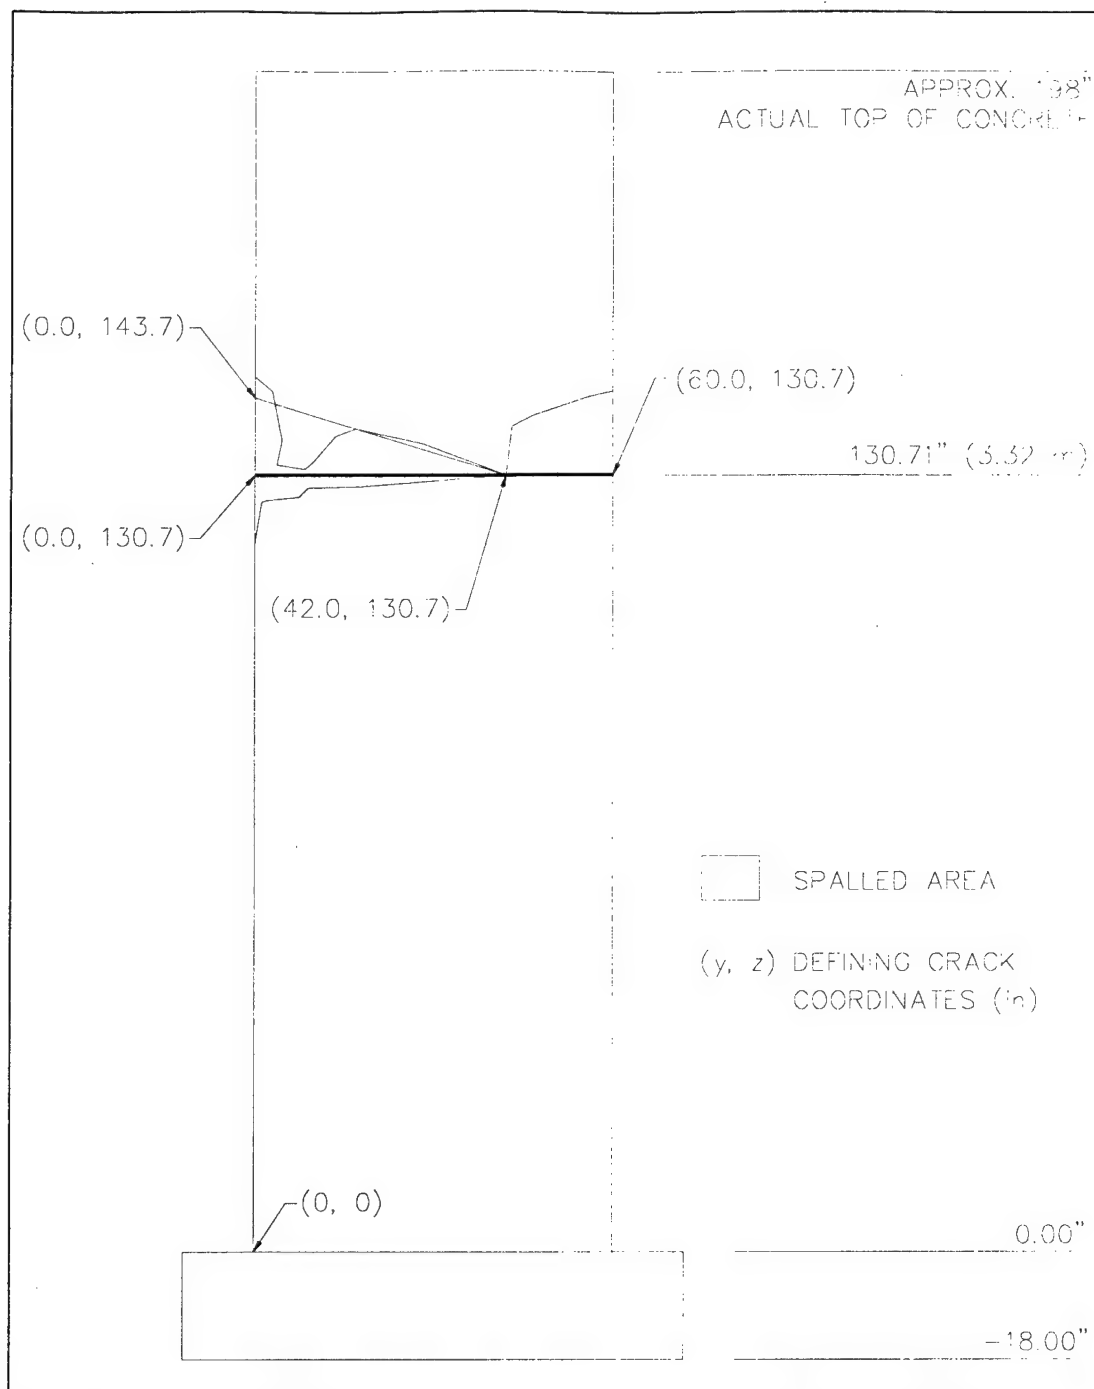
Drawing of the downstream face showing cracks, spalling, and primary crack coordinates.
